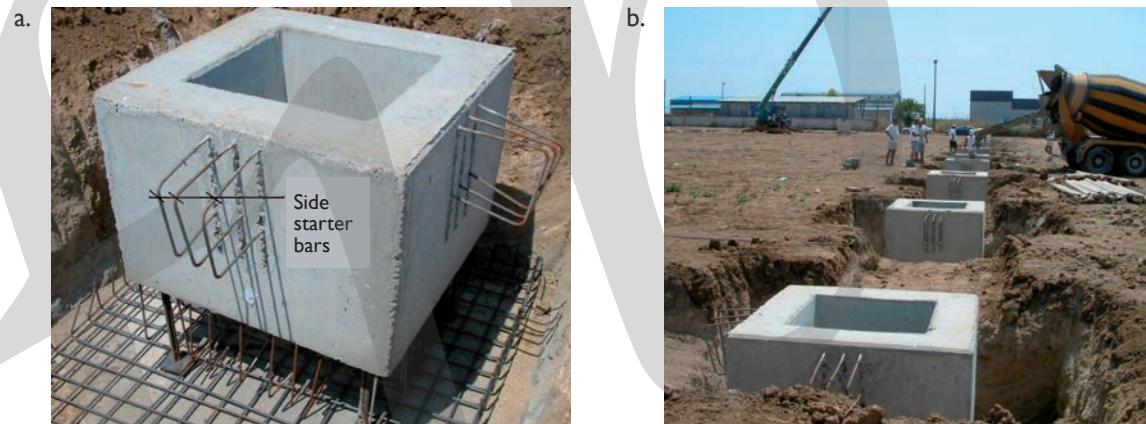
Typical socket foundation with side starter bars for connection with tie-beams:
